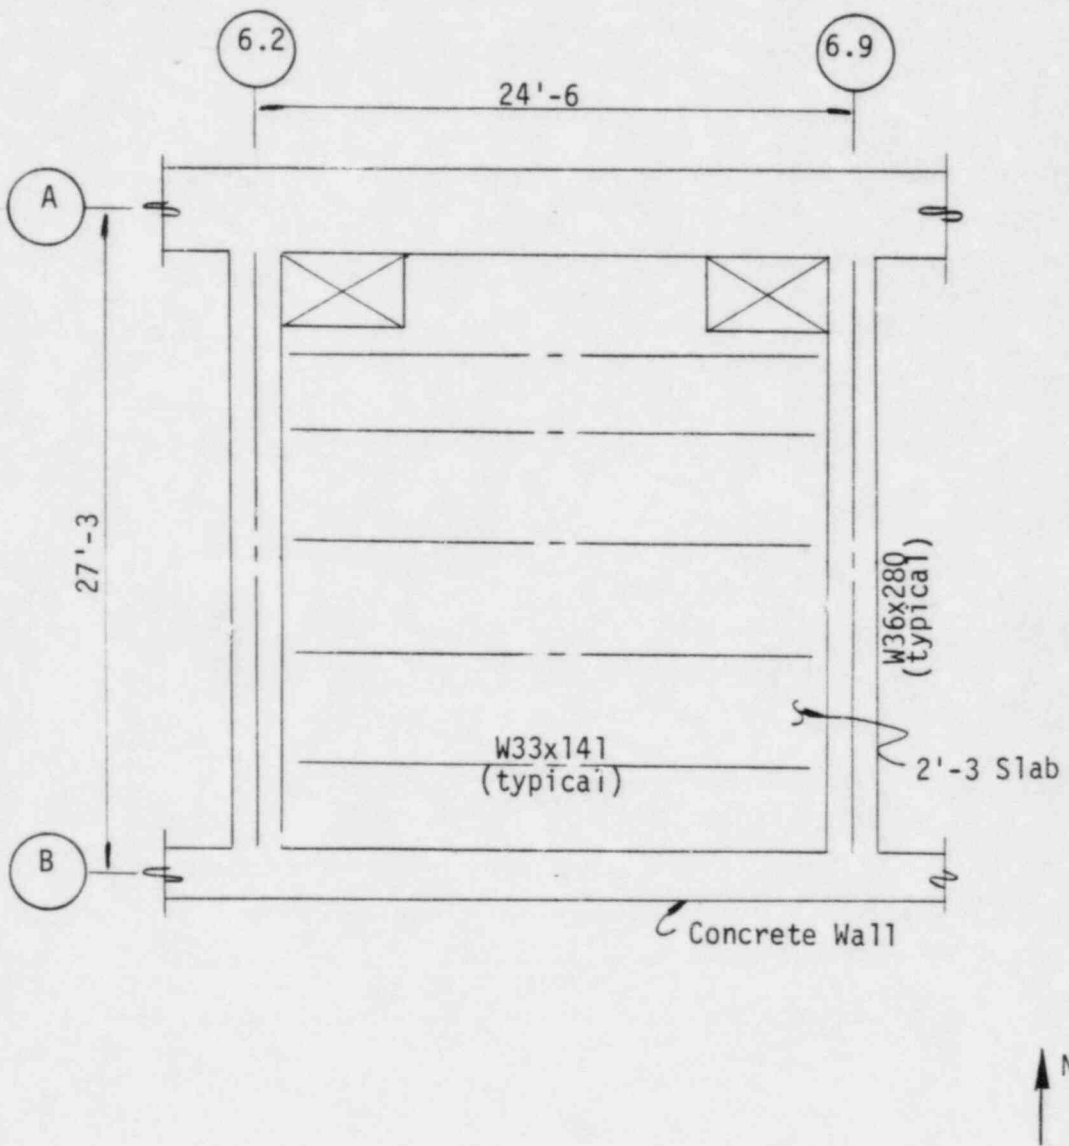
AUXILIARY BUILDING FLOOR AT ELEVATION 584'-0
